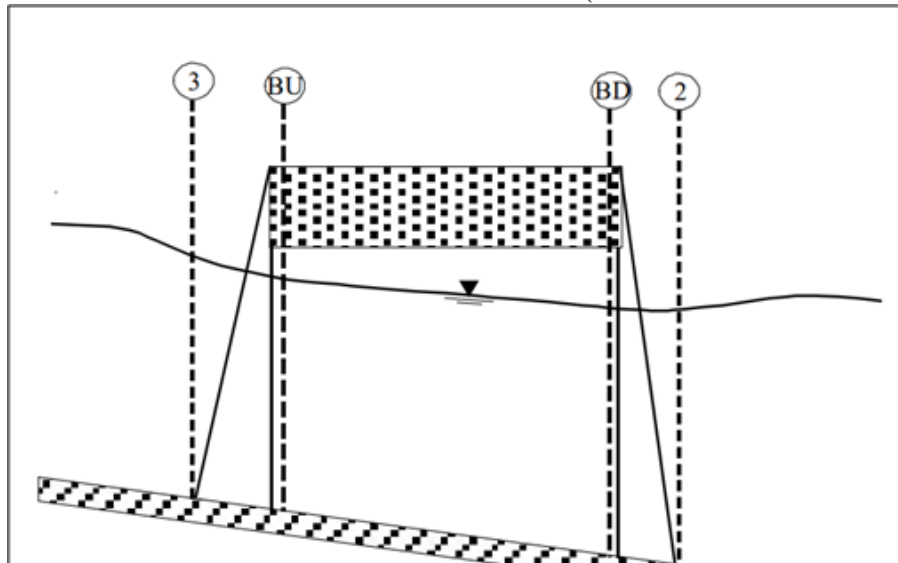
Cross Sections Near and Inside the Bridge (Brunner and CEIWR-HEC, 2020)
